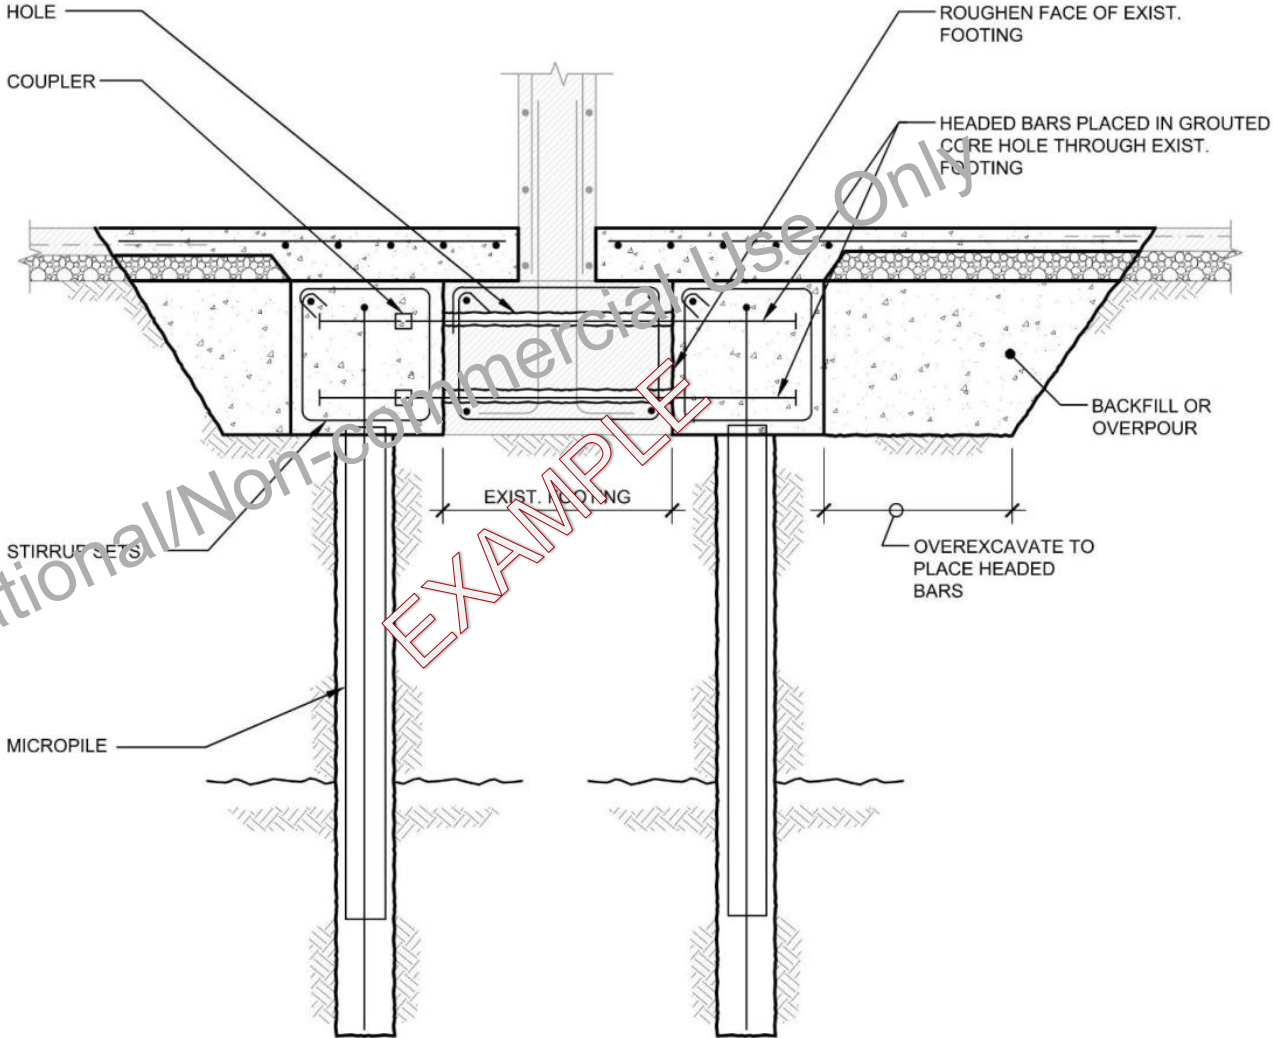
Addition of micropiles adjacent to existing strip footing
